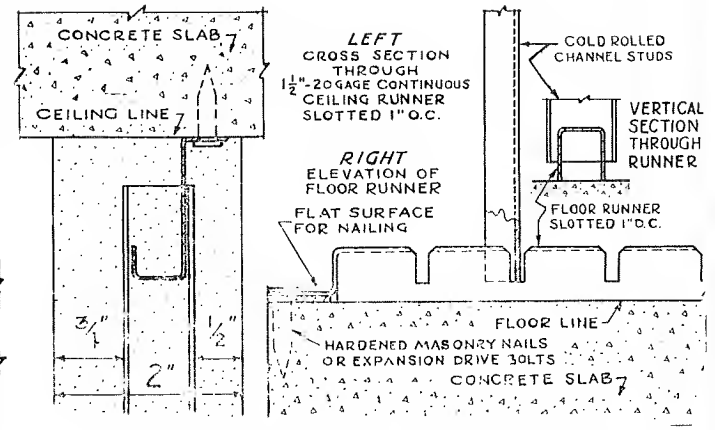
SLOTTED AND PERFORATED RUNNER SYSTEM—S-shaped runners for ceiling have 1/2-inch nailing flange and 1/2-inch horizontal flange with upturned edge both slotted for channel studs. Floor runners are U-shaped with flanges down and web and flanges slotted. Studs are first slipped into ceiling runner and then dropped into floor runner.
